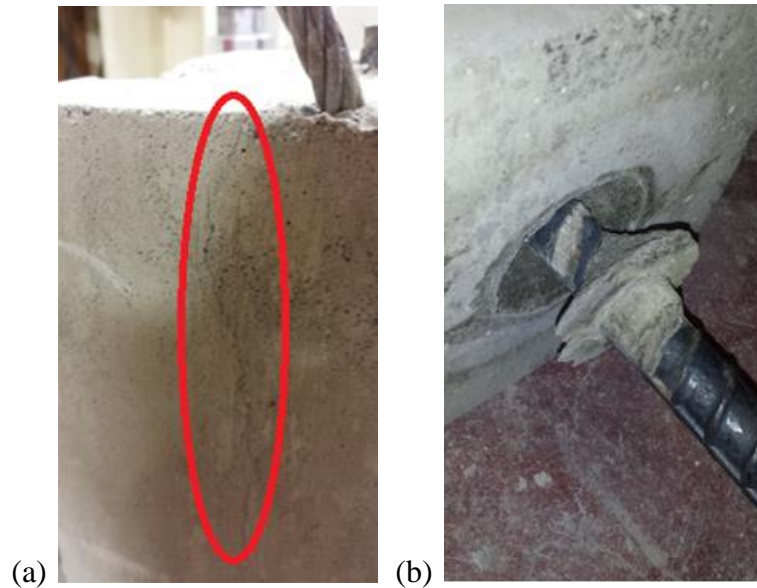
Specimen damage: a) hairline cracking of concrete block; b) grout conical failure.
